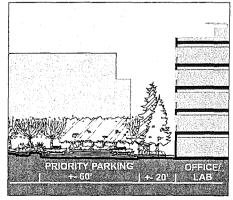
(NEAR RIGHT) Typical Parking Orchard
